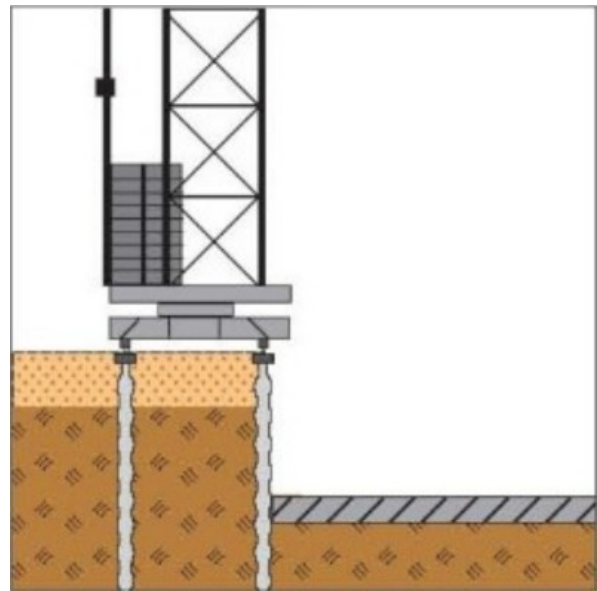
Retaining wall supporting a crane at the edge of an excavation.
